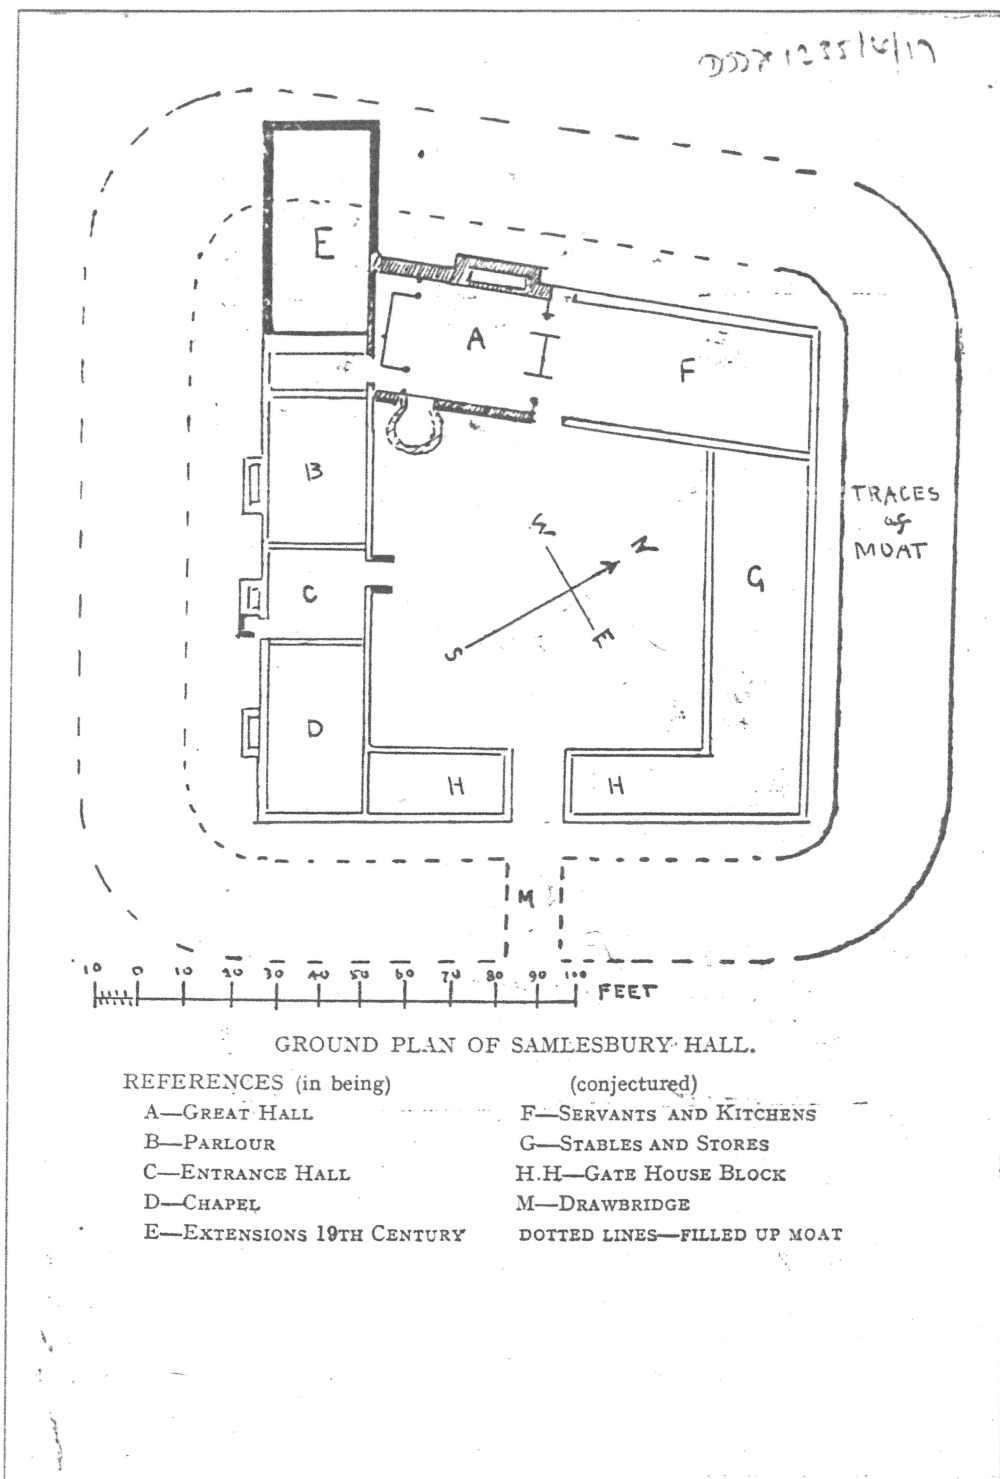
reconstruction plan showing suggested line of moat, Eaton, 1825
